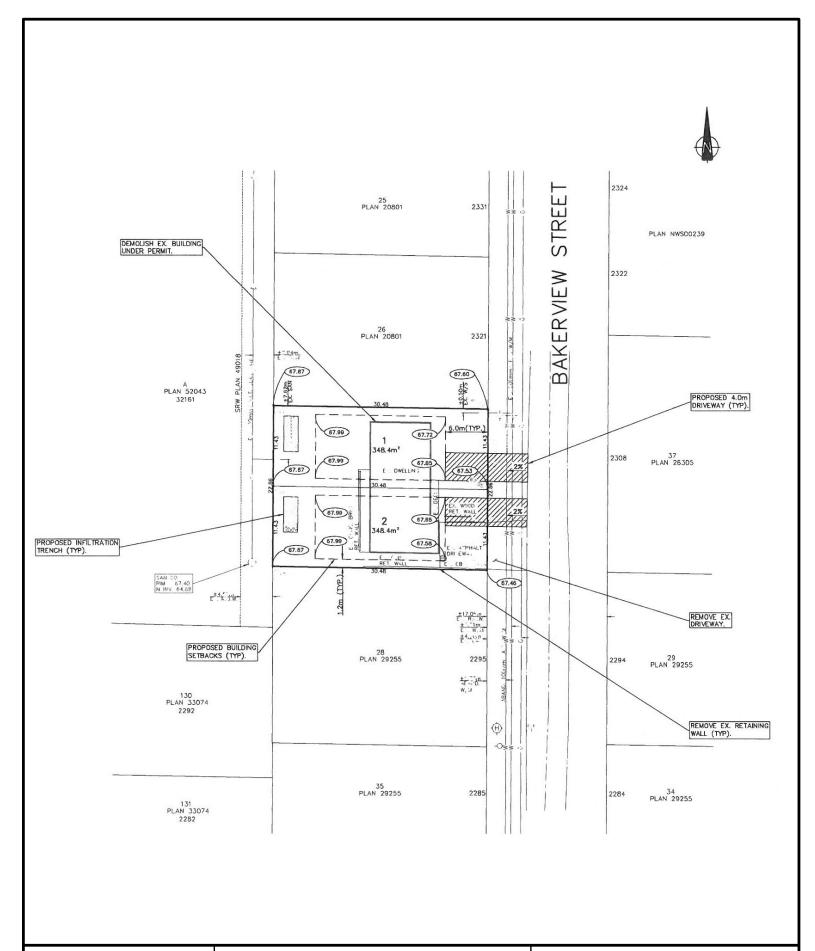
Lot Grading Plan File No.: PRJ21-119
